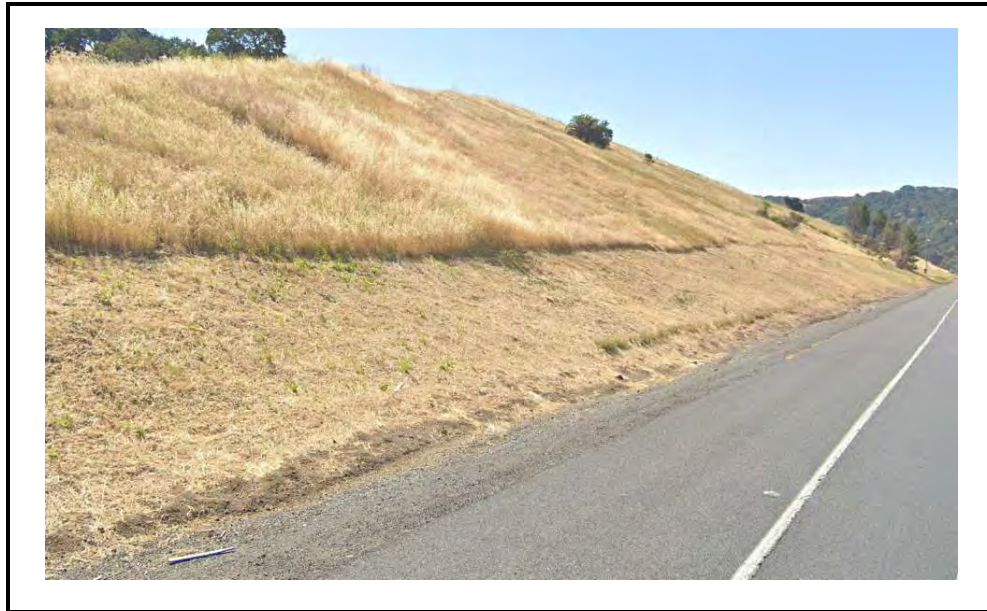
PHOTO A: CUT SLOPE, VEGATED STRIP AND SWALE – (SOUTHEAST)
